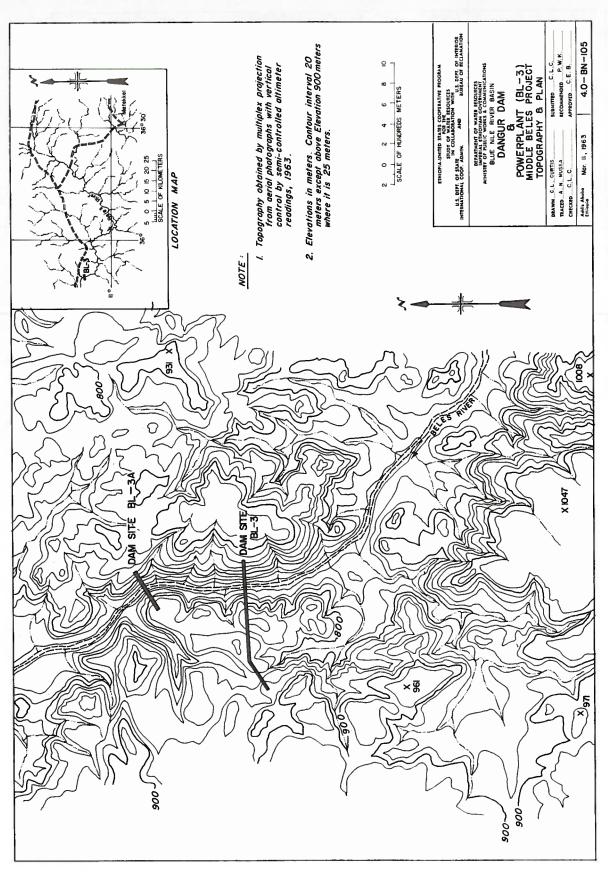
Dangur Dam and Powerplant (BL-3)--Topography and Plan
